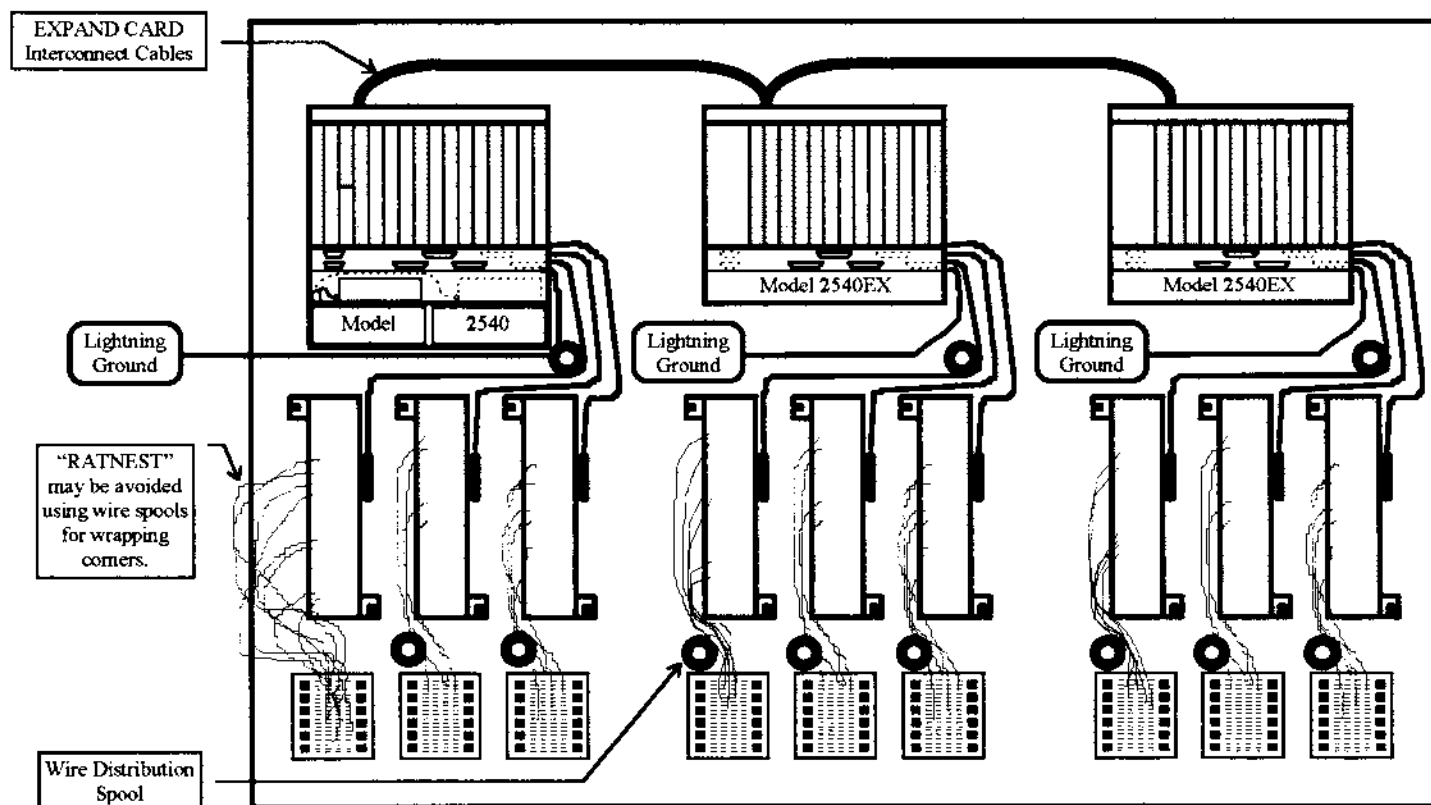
Sample FASTNet Layout on Plywood Sheet
